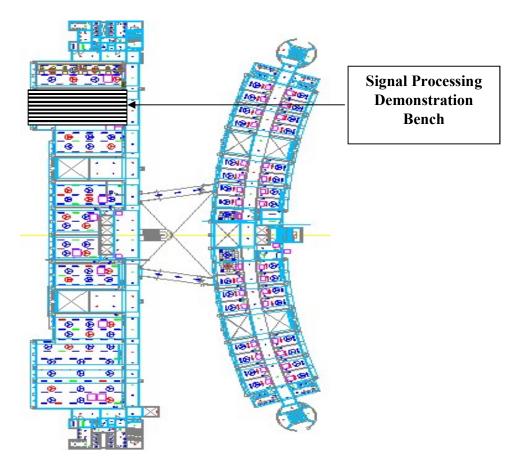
Floor Plan View of Signal Processing Demonstration Bench
